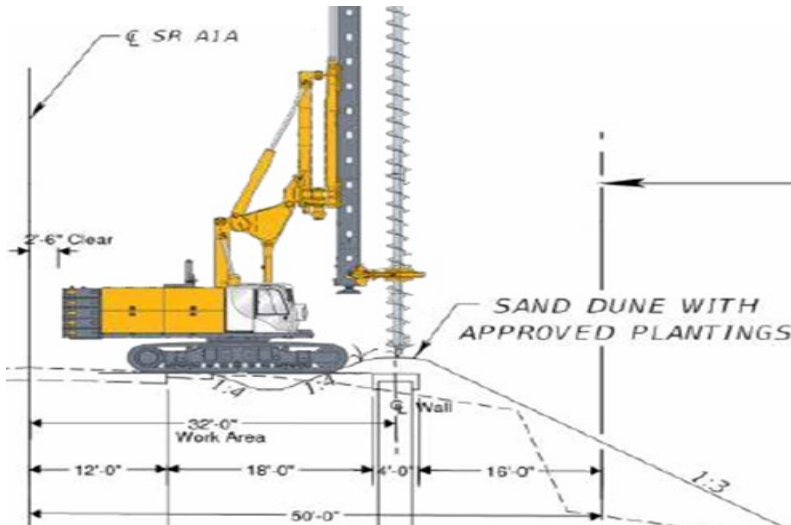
Typical section of secant-pile installation for retaining wall construction.
